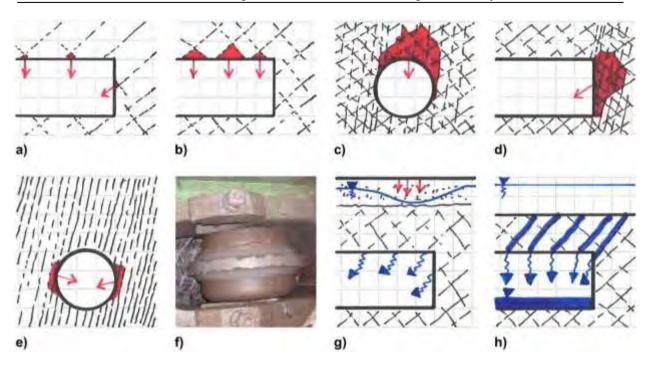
Typical hazard scenarios (hard rock TBM tunnelling): a) rock fall; b) instability of rock wedges; c) "loosening"; d) face instability; e) slabbing or spalling; f) major wear of the cutters [6]; g) inadmissible surface settlements; h) major water ingress.
